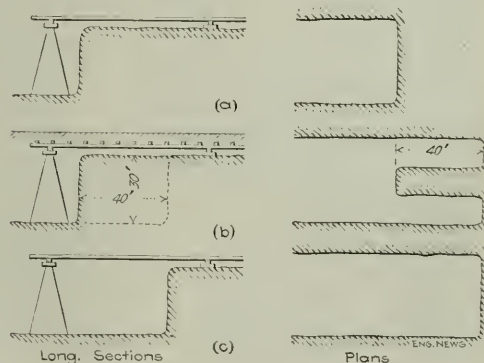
SKETCH ILLUSTRATING PROGRESS OF EXCAVATION IN DEEP ROCK TUNNEL ON SECTION 13, LEXINGTON AVE.
